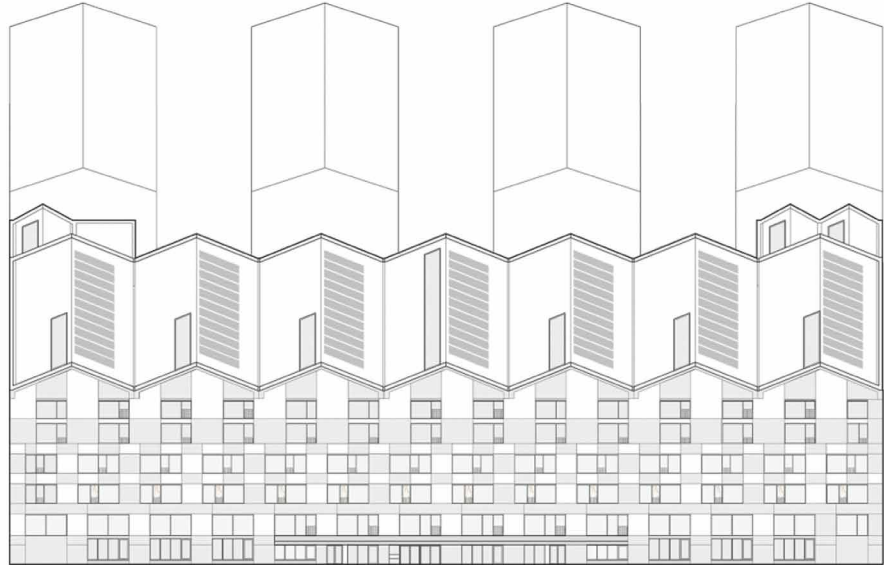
Elevation of the new building of the Campus Cadix. Source: KSA
